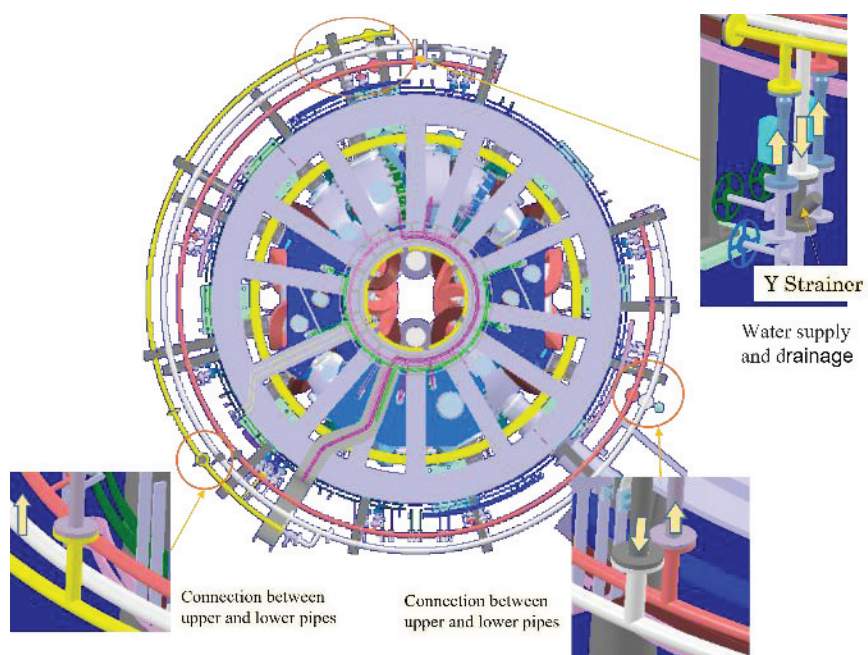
installation location of the straight main pipes and water supply pipes.
